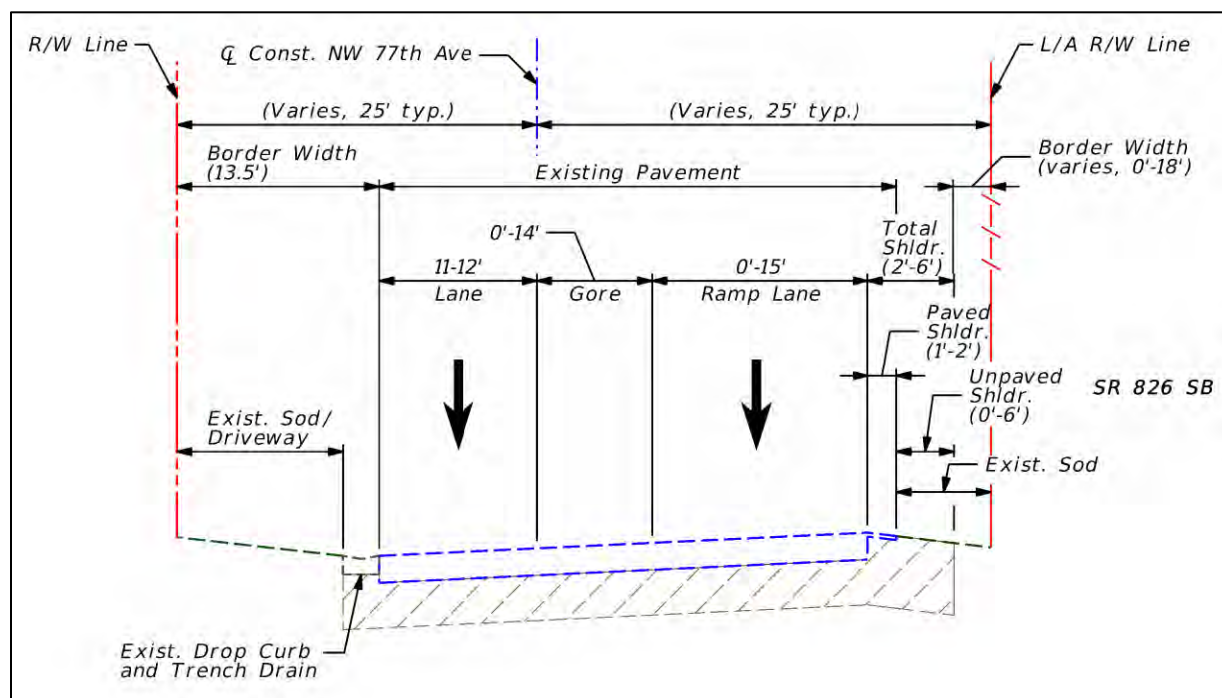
Existing Frontage Road (One-Way) – Typical Section 6 (West Frontage Road/NW 77th Avenue)
